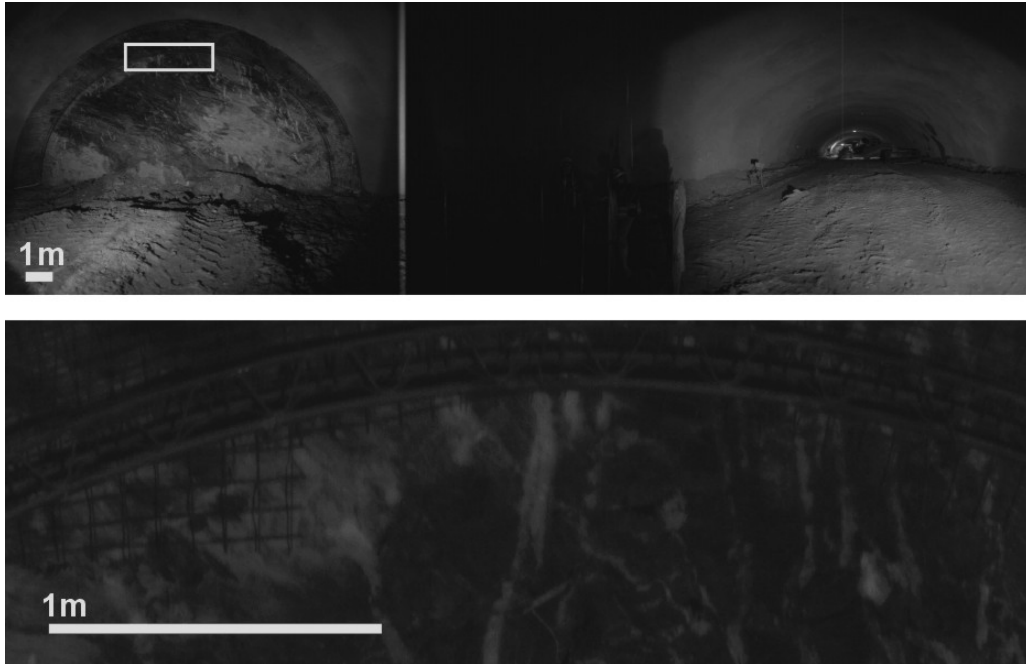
Panoramic image taken at the Unterwald tunnel construction site (top).
